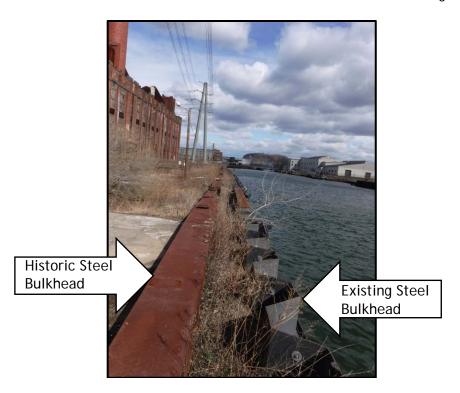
Historic and existing bulkheads along Ball Island, looking north, photo taken March 18, 2016.
